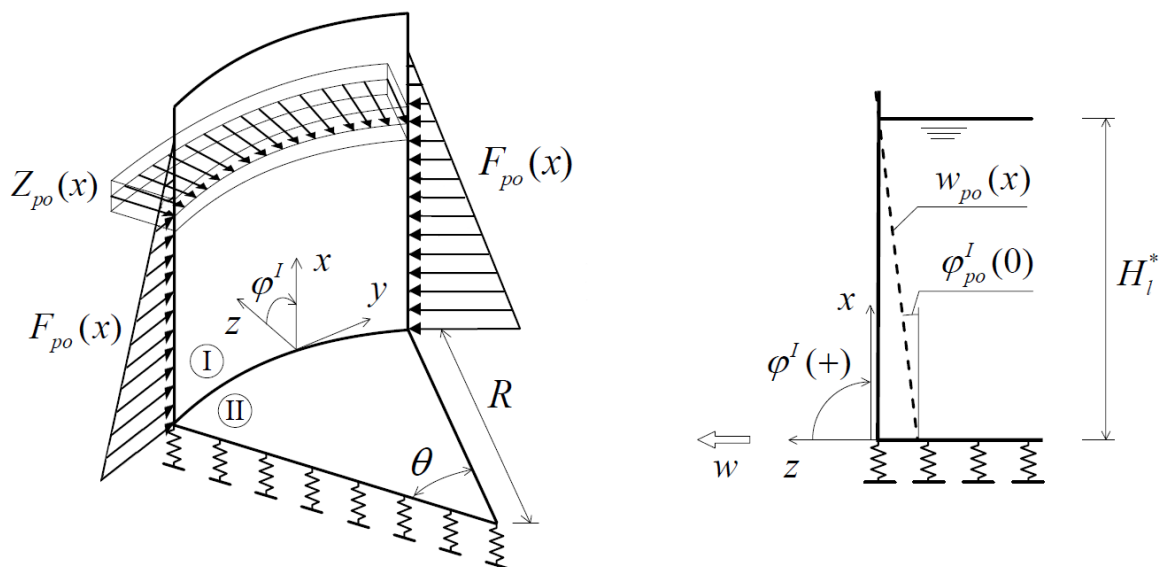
Load direction and deformation of a cylindrical wall subjected to prestressing load (R. Braam, 2010)
